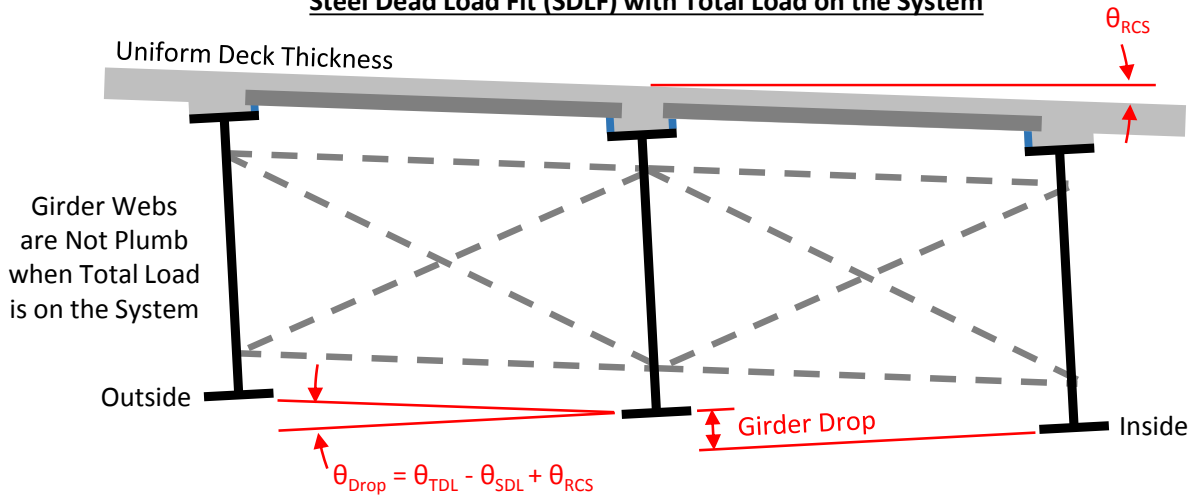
Steel Dead Load Fit (SDLF) of Cross-Frames for I-Girders
